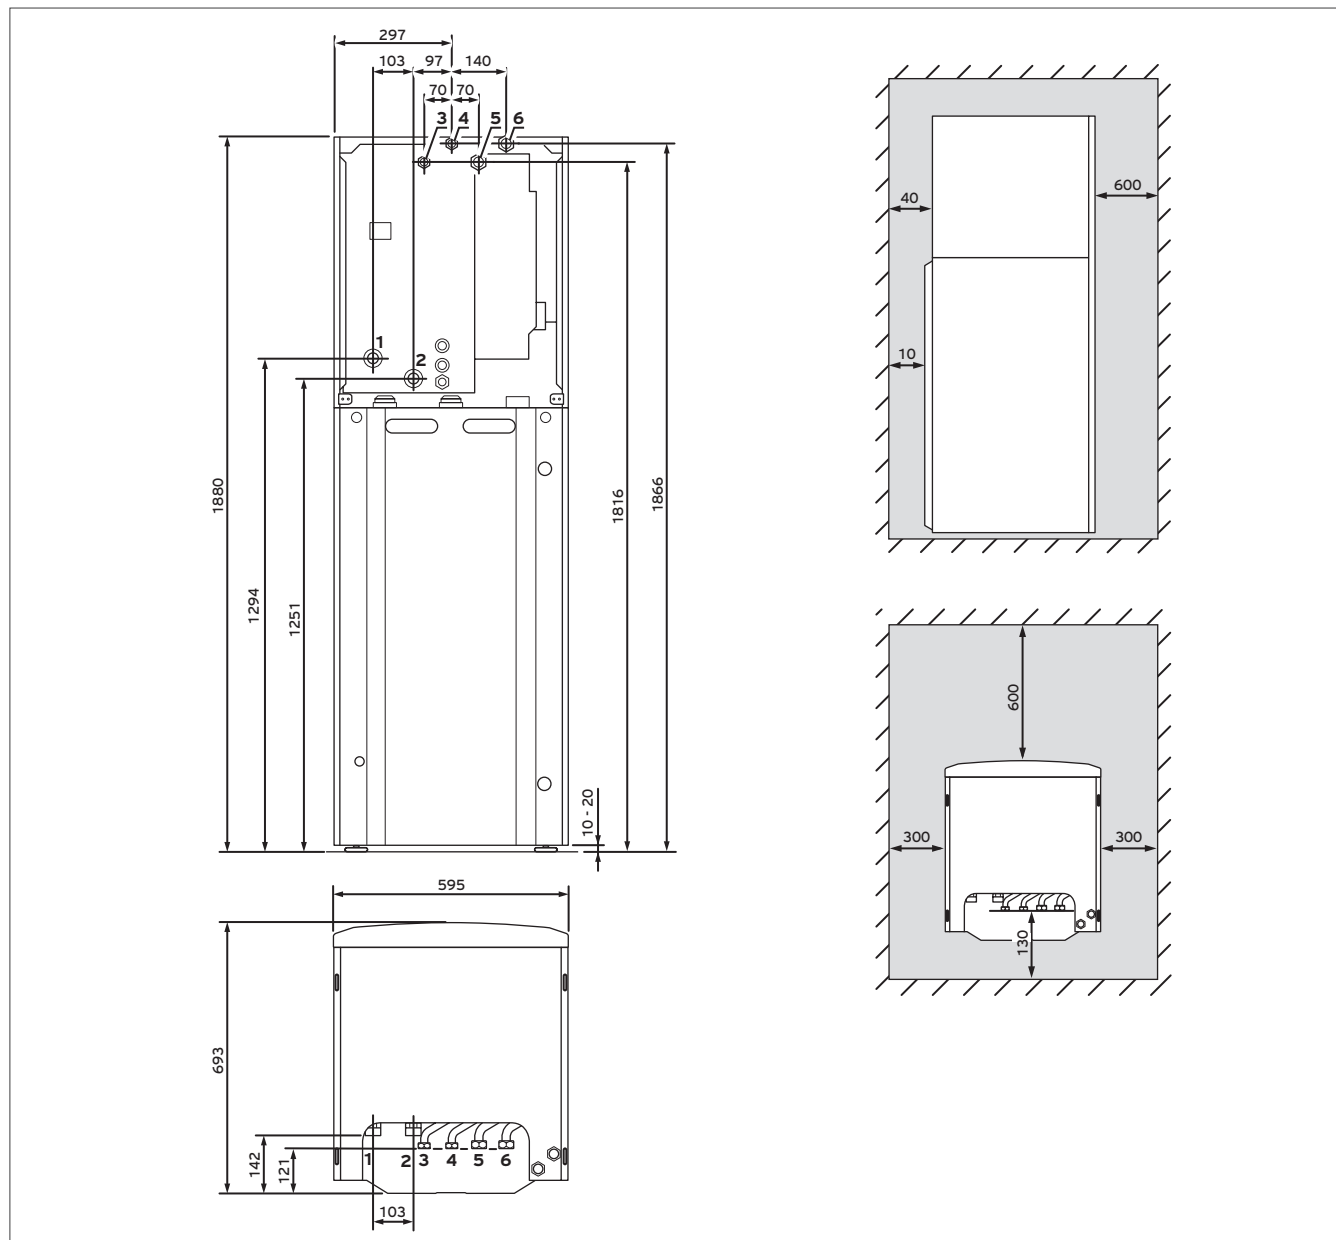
unitTOWER VIH QW 190/6 E dimension drawing and connection dimensions
